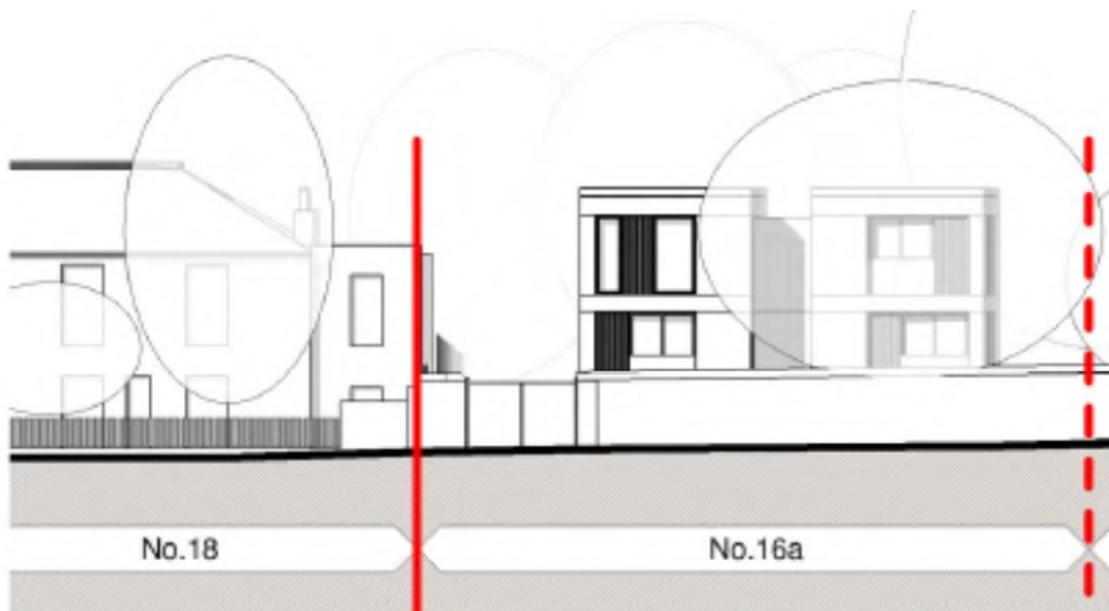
Applicants' Design Statement (p. 52): Proposed street elevation (trees indicated)
